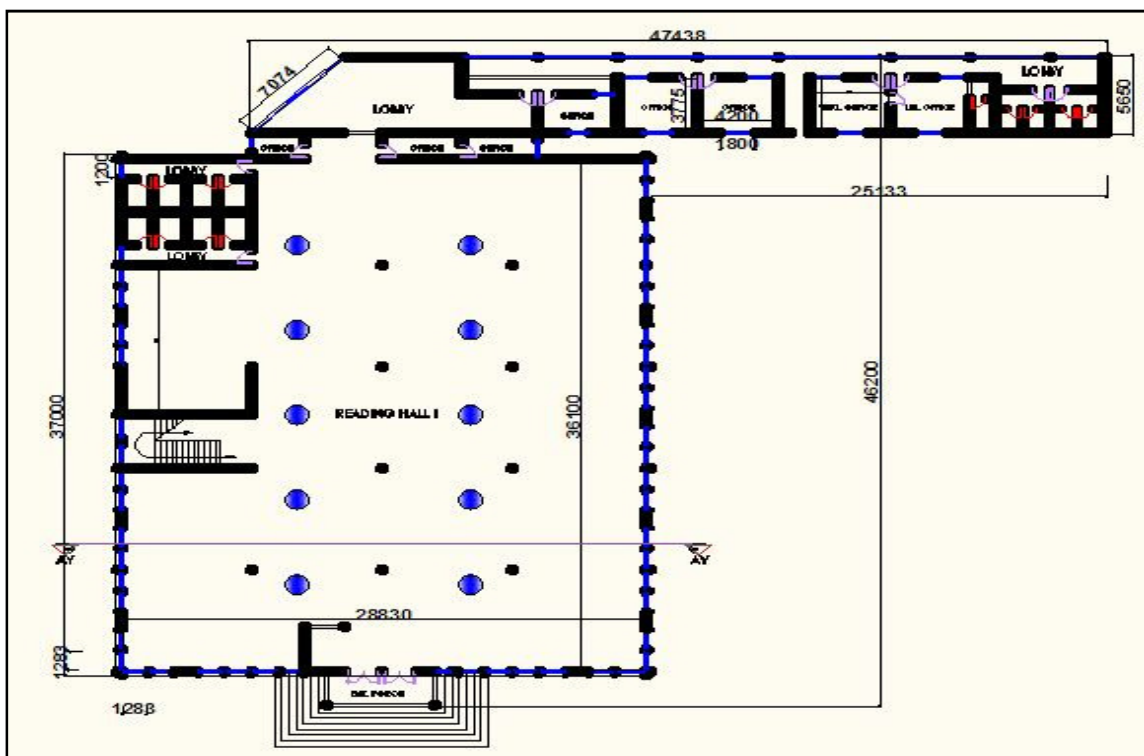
Ground floor plan of the IBB library showing positions of lux meter
